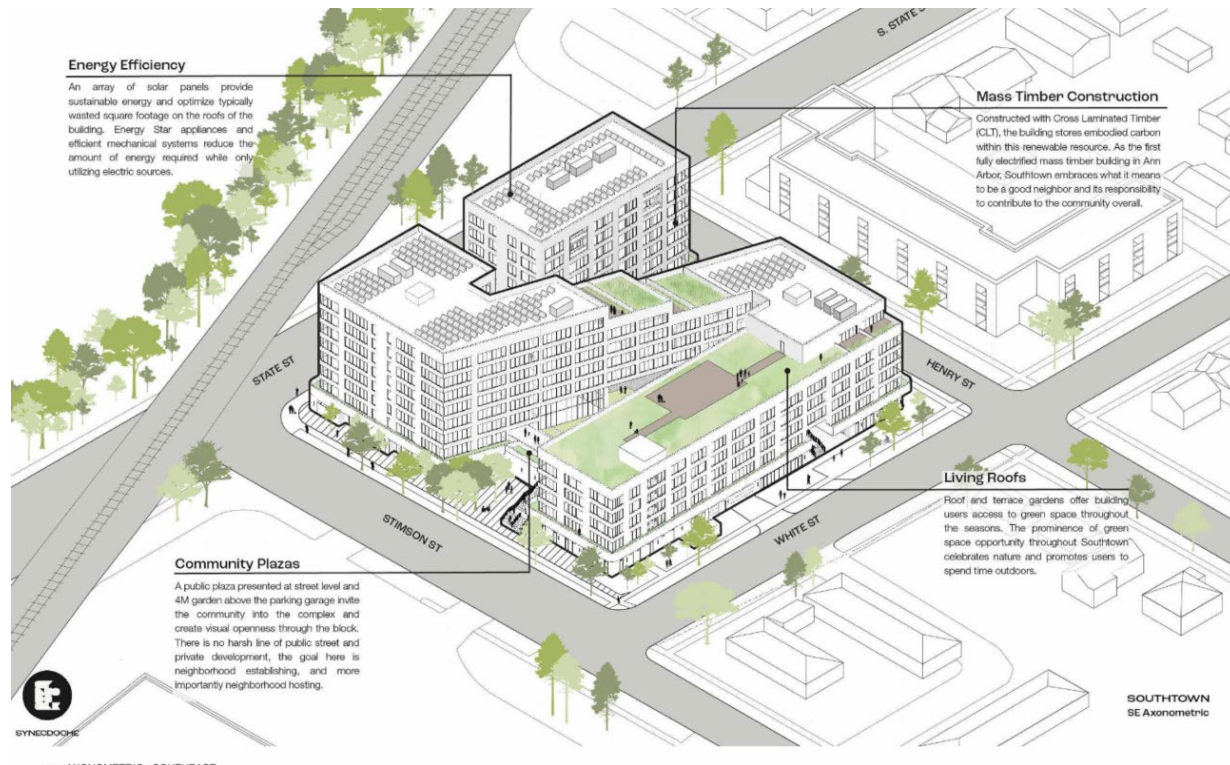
Axonometric Site Layout (from Stimson/White corner looking NW)
